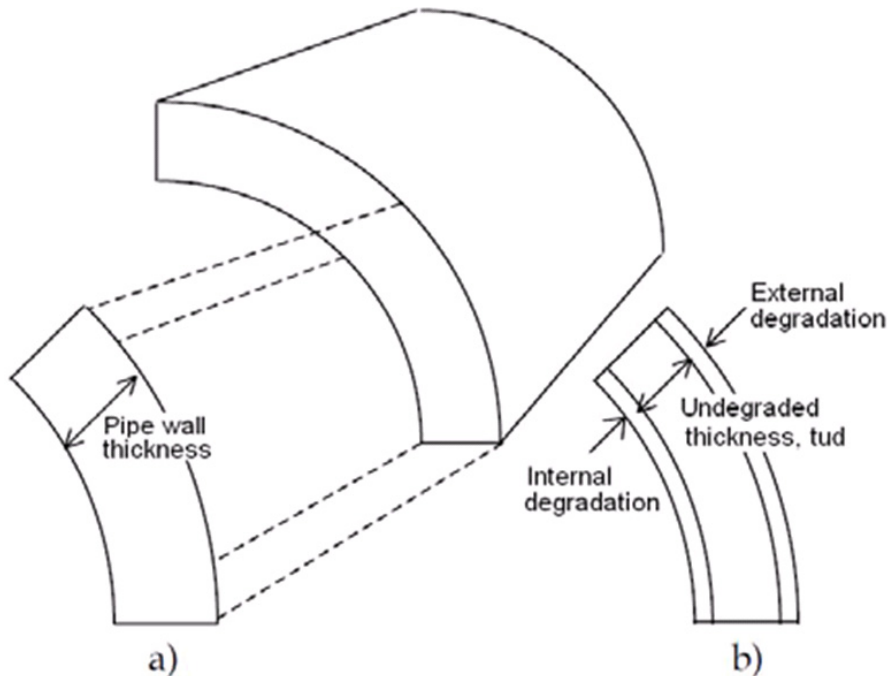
Pipe Wall Thickness and Assessment of Effective Pipe Wall Thickness (un-degraded pipe wall thickness) (Hu 2013a)
